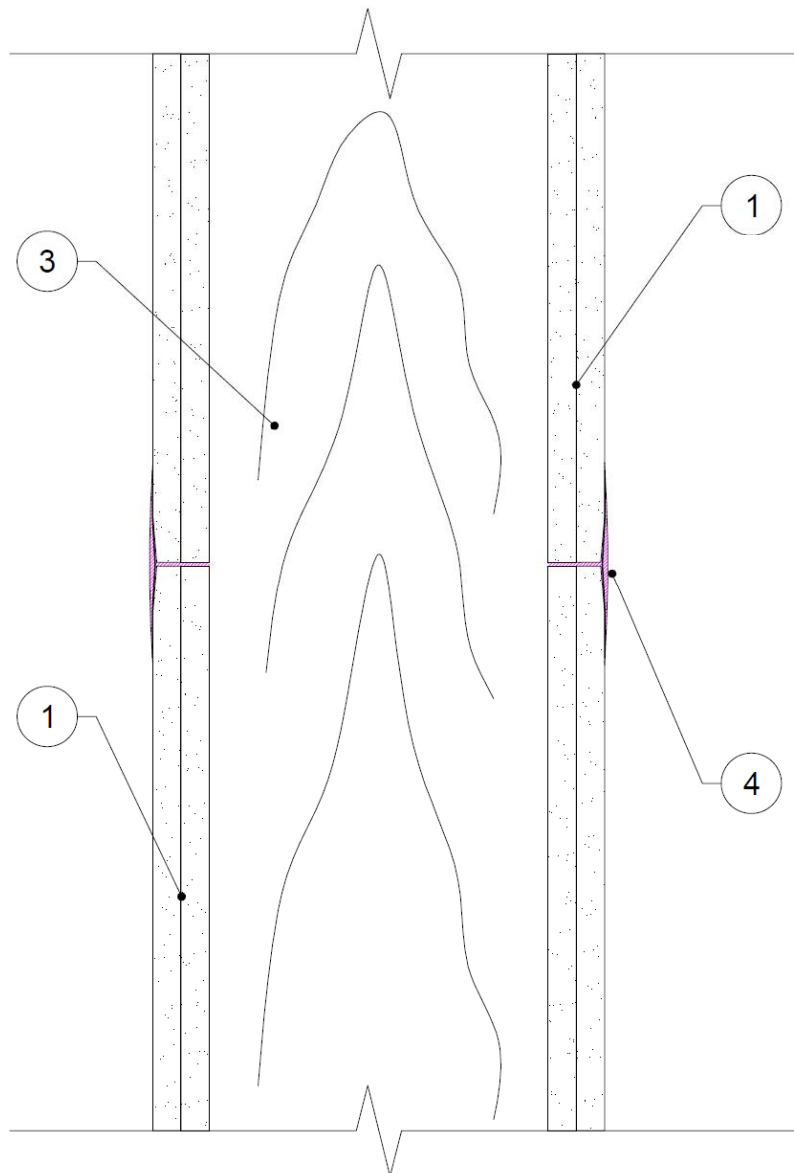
Elevated Section at Horizontal joint in Multiboard, Section D-D
